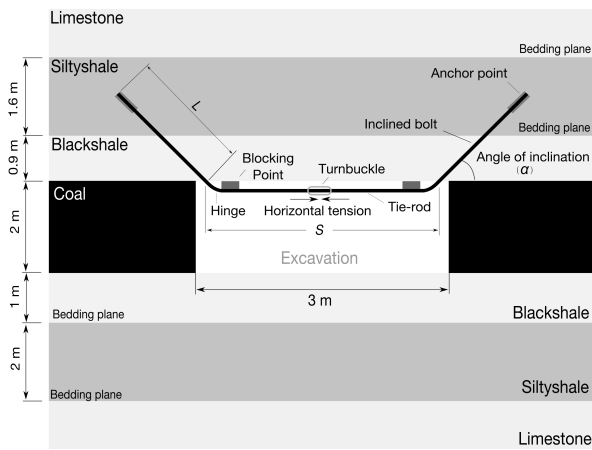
Schematic view of truss bolt, tunnel and model dimensions
